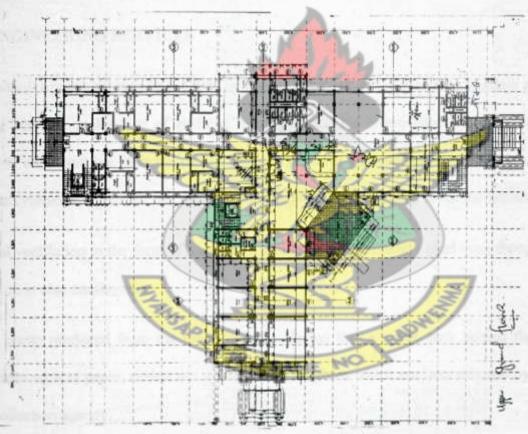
Ground floor plan of the Kumasi Appeal Court
